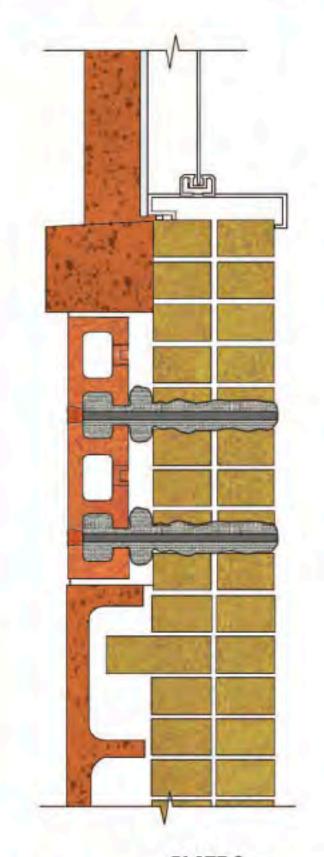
FIXING TERRA COTTA CLADDING TO BRICK BACK UP WITH AIR GAP
